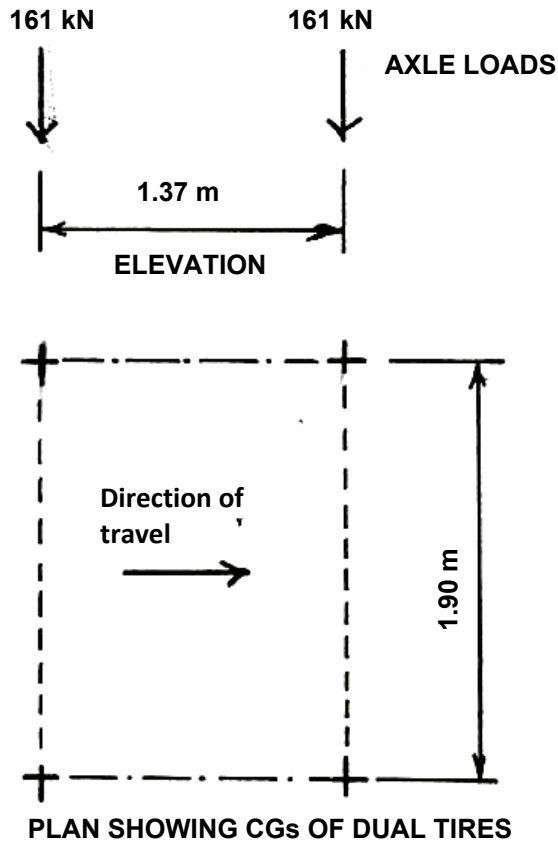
Proposed Light Off-highway Design loading for timber decks
